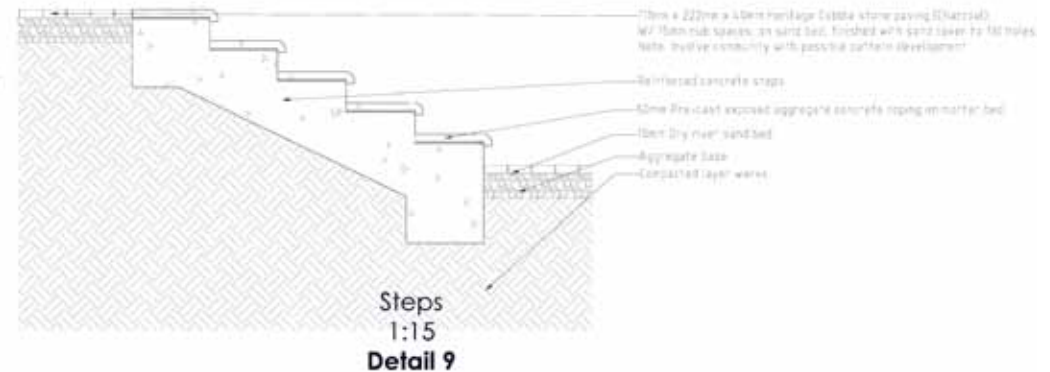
STEPS DETAIL (not to scale) (AUTHOR, 2011)
